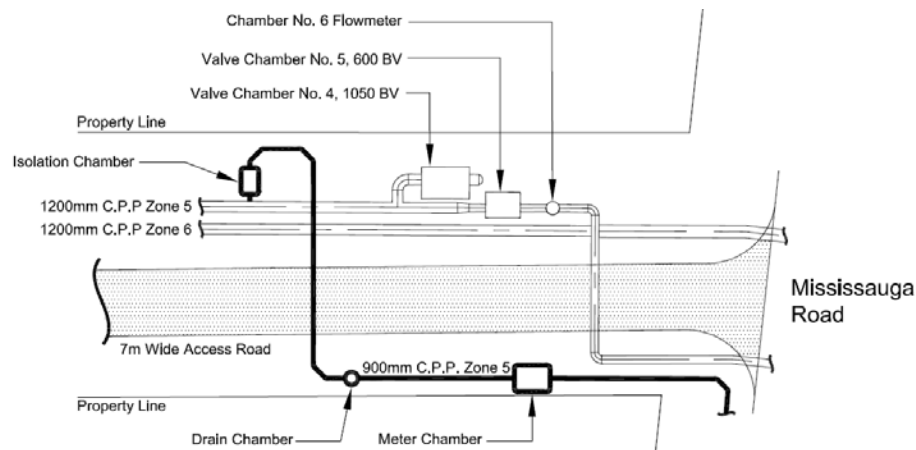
Schematic of Connection at West Brampton Reservoir and Pumping Station
